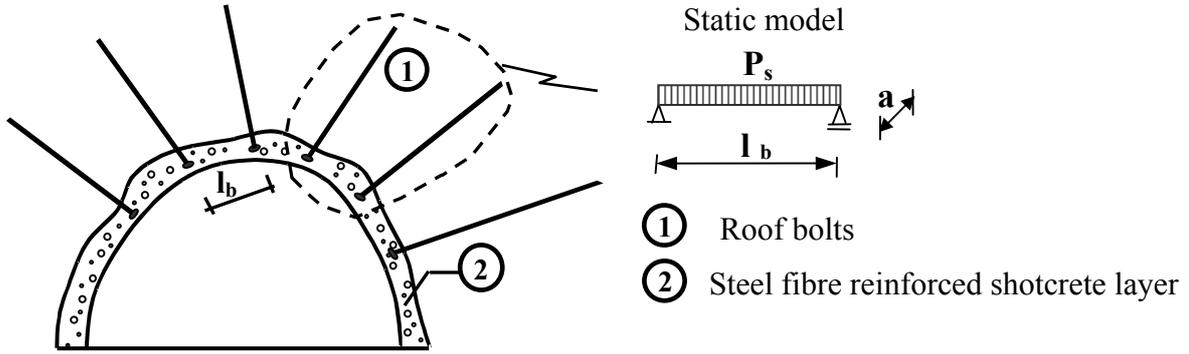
Cross section of tunnel with steel fibres reinforced shotcrete layer
